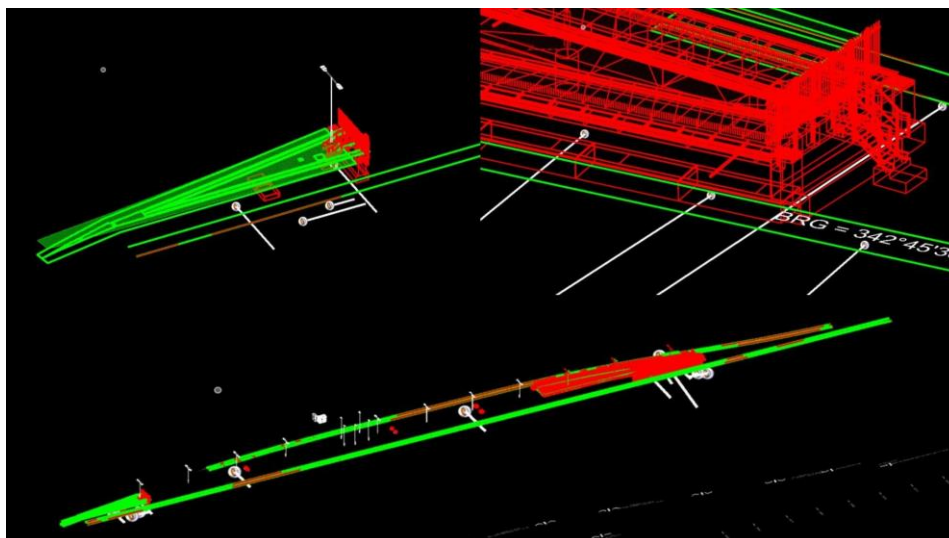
Technical Drawing of LOC Design for Ancillary Package
